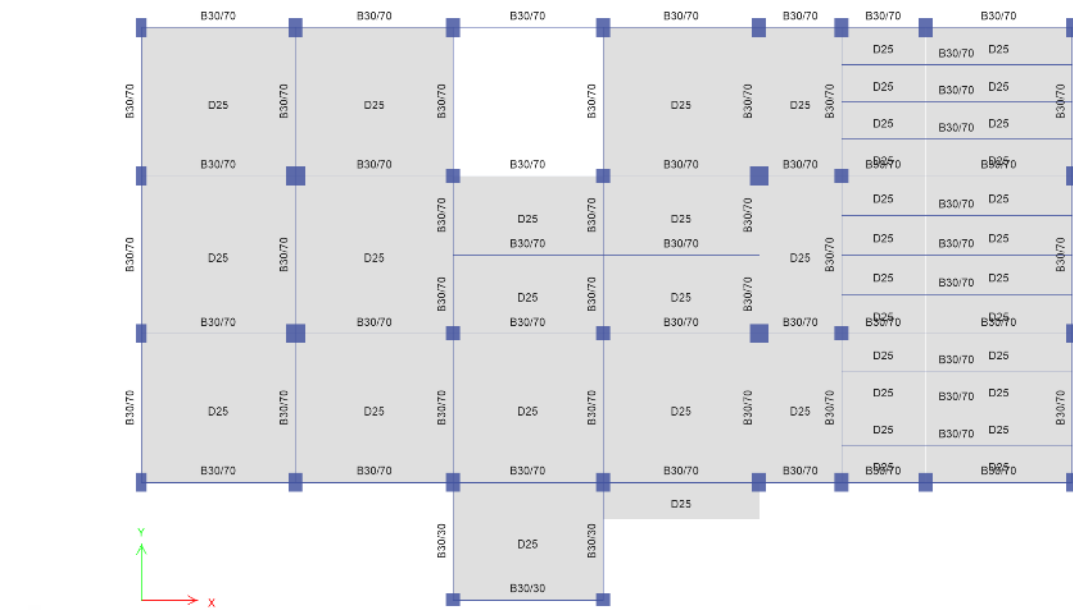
Formwork plan and element sections for the Ground and the 1st Floor.
